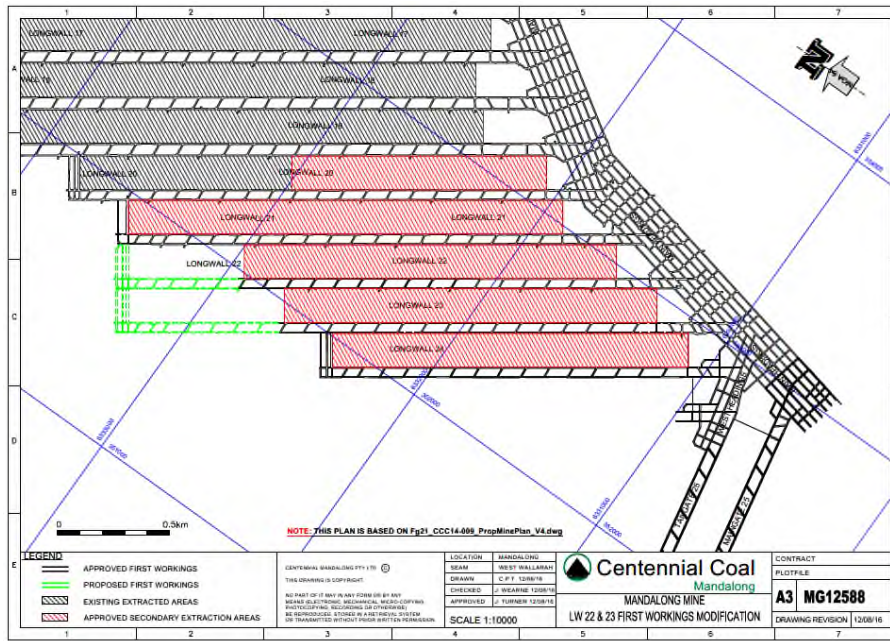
Detail of the proposed modification for MG22 and MG23 outside the Mandalong South approved plan (shown in green)
